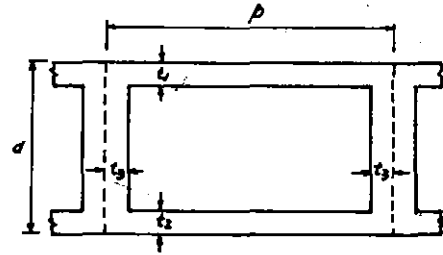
Nomenclature for torsional stiffness calculations of box section bridge beams
